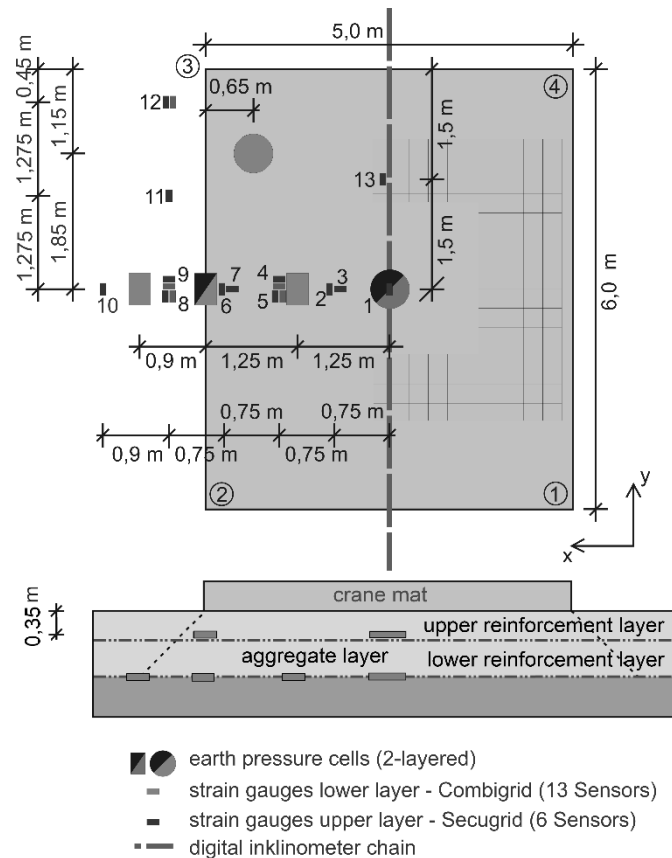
Setup and dimensions of the test field and arrangement of the sensor devices.
